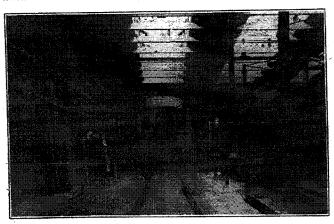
Arrangement of Track in Passenger Car Shop.
